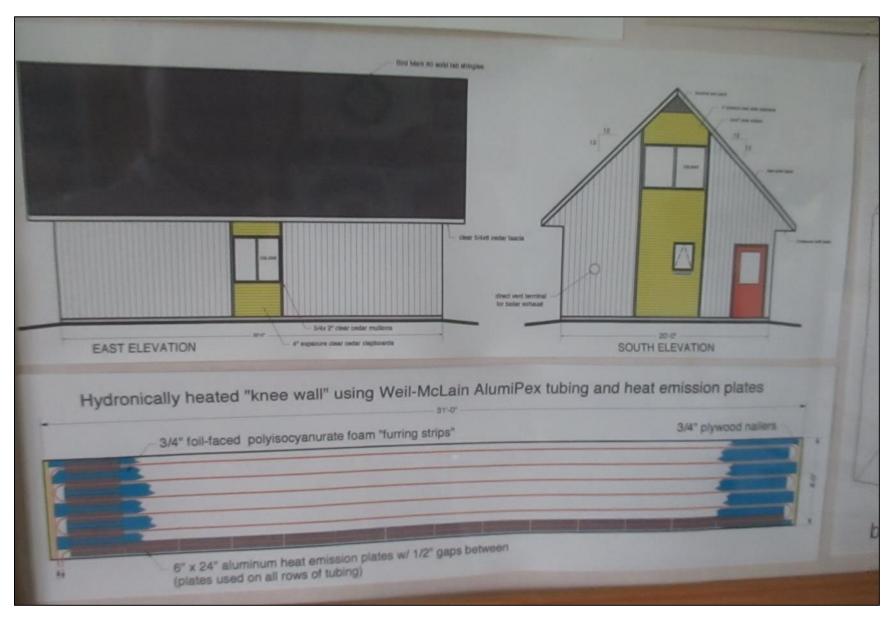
Steuben Valley Road - Radiant Floor Drawings
